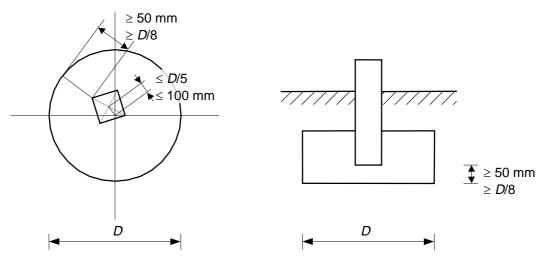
Position of the prefabricated foundation pile within the foundation hole
